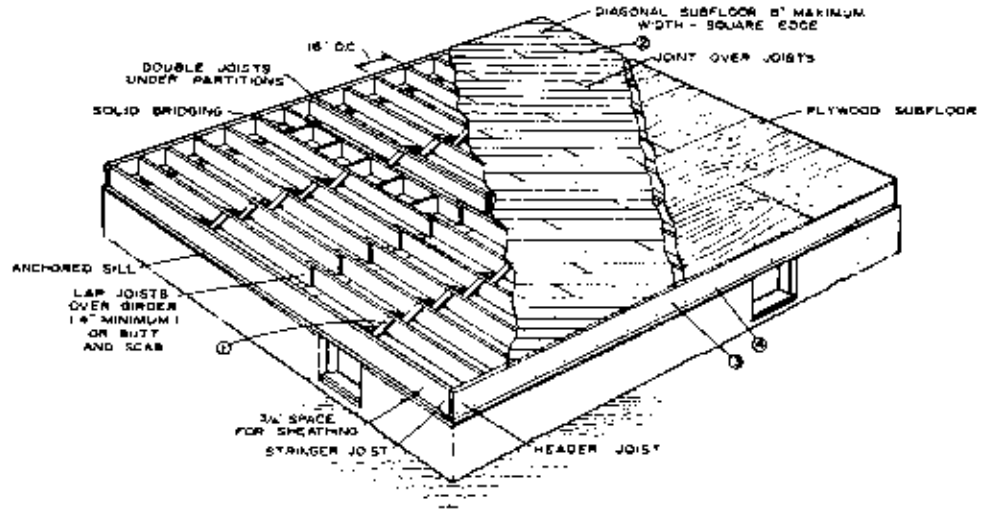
Floor framing for platform frame construction. (U.S. Department of Agriculture)
